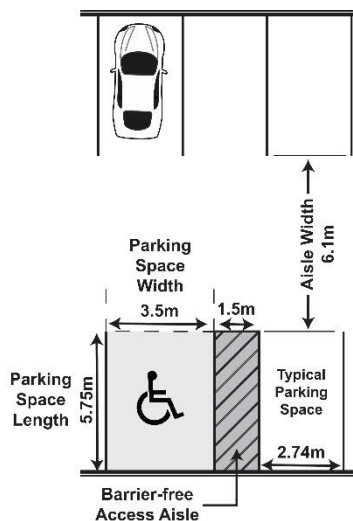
Illustration of Requirements for Standard Parking Spaces
